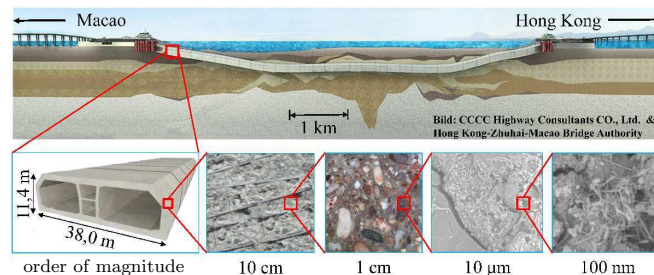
Immersed tunnel of Hong Kong – Zhuhai – Macau Bridge, after [2]
